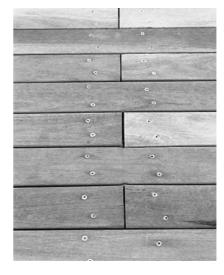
Staggering of plank joins in wide sections of decks is facilitated by paired joists
